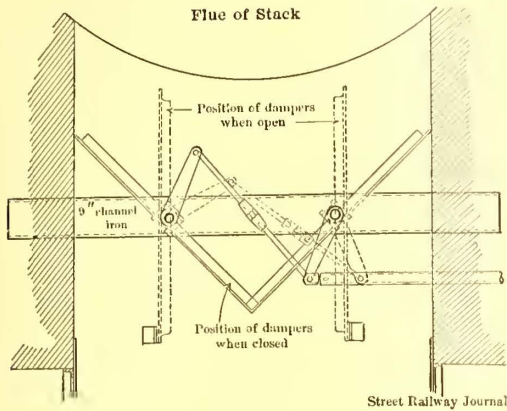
PLAN OF STACK DAMPERS IN NEWARK STATION.
